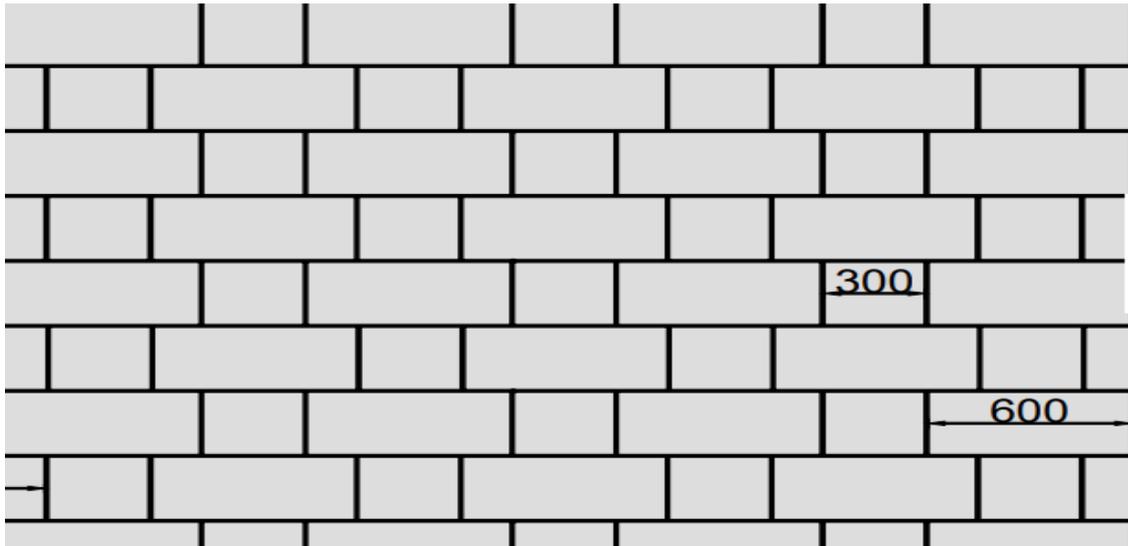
Sketch showing 'Flemish bond' pattern along longer surface of new Pier Jacketing Wall
